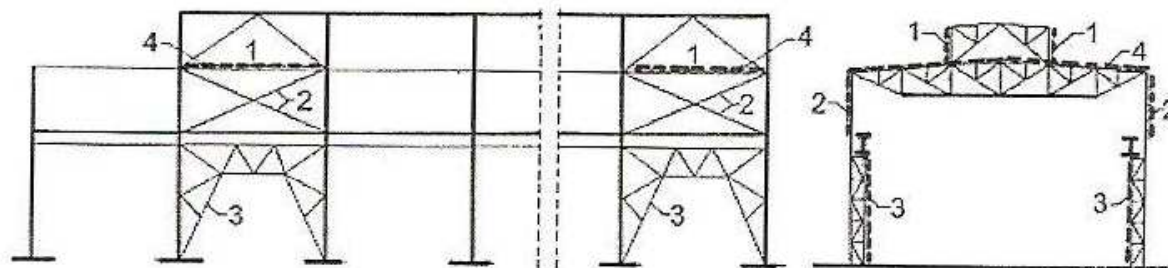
Location of sidewall bracings in industrial building with top-running crane: 1- skylight, 2- bracing over crane runway beam, 3- bracing under the crane runway beam, 4- roof bracing
